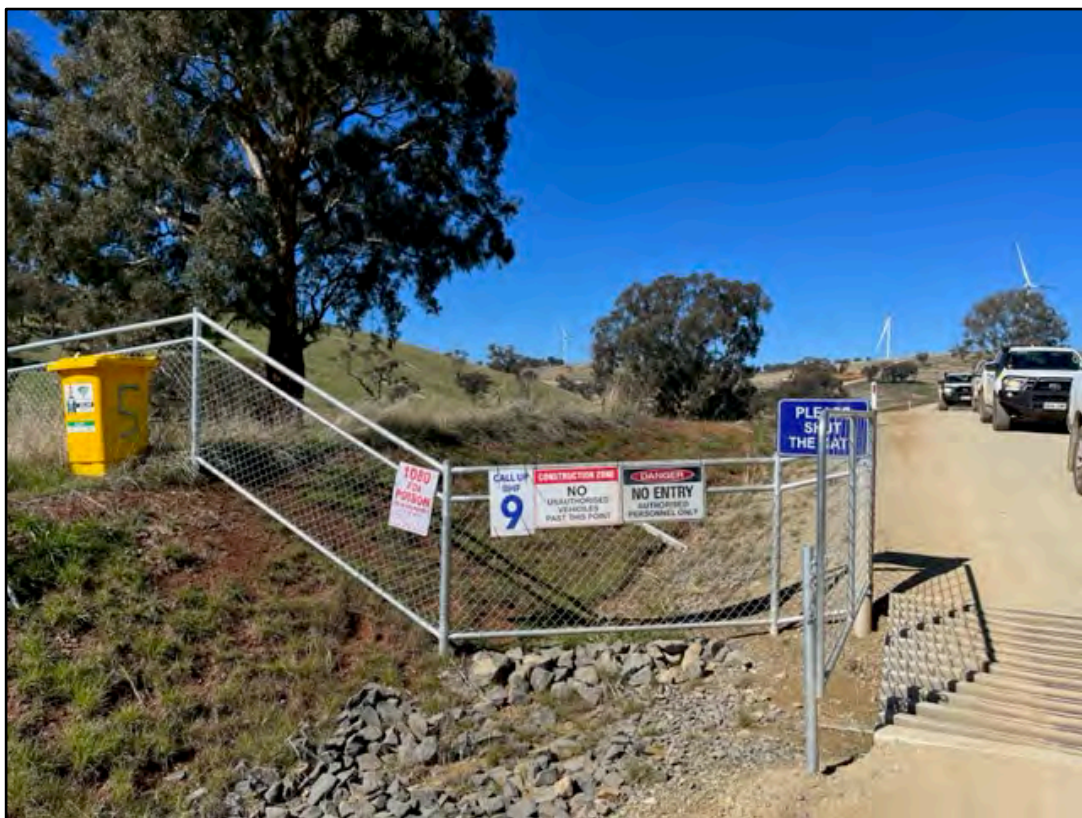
View of the site access gate for Collector Group 3. Controls present at this location included relevant signage, a shaker-grid and spill kit. Some minor sediment drag-out onto the adjoining public road was noted at this location.
